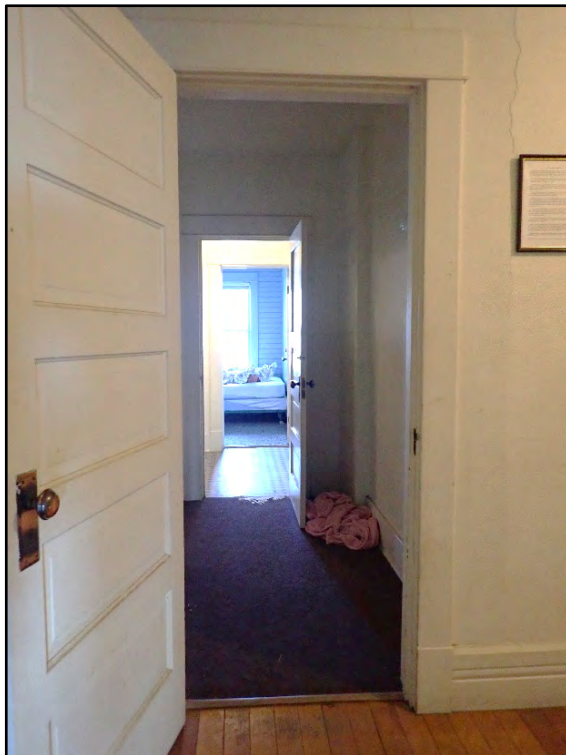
Passing through the interior hall and looking back into it from the main hallway of the second floor (the sleeping porch is visible beyond).
